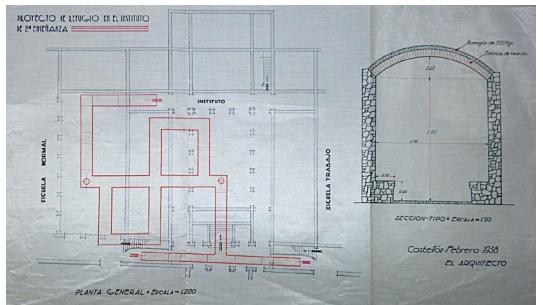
IES Ribalta Shelter, Floor Plan and Section, AHMC (Note 1) 1938, Maristany, Plan, 1/200, 1/20 47.5 x 27.5 cm, paper, black ink, and salmon
